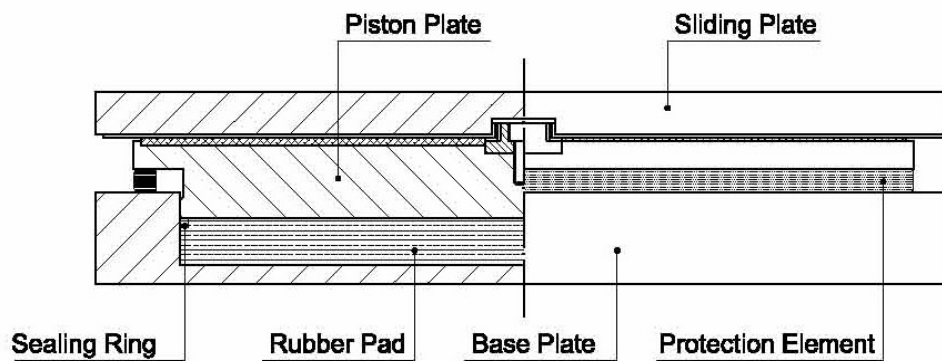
Cross-section of a Sliding Guided Bearing (Wabodec PG)
